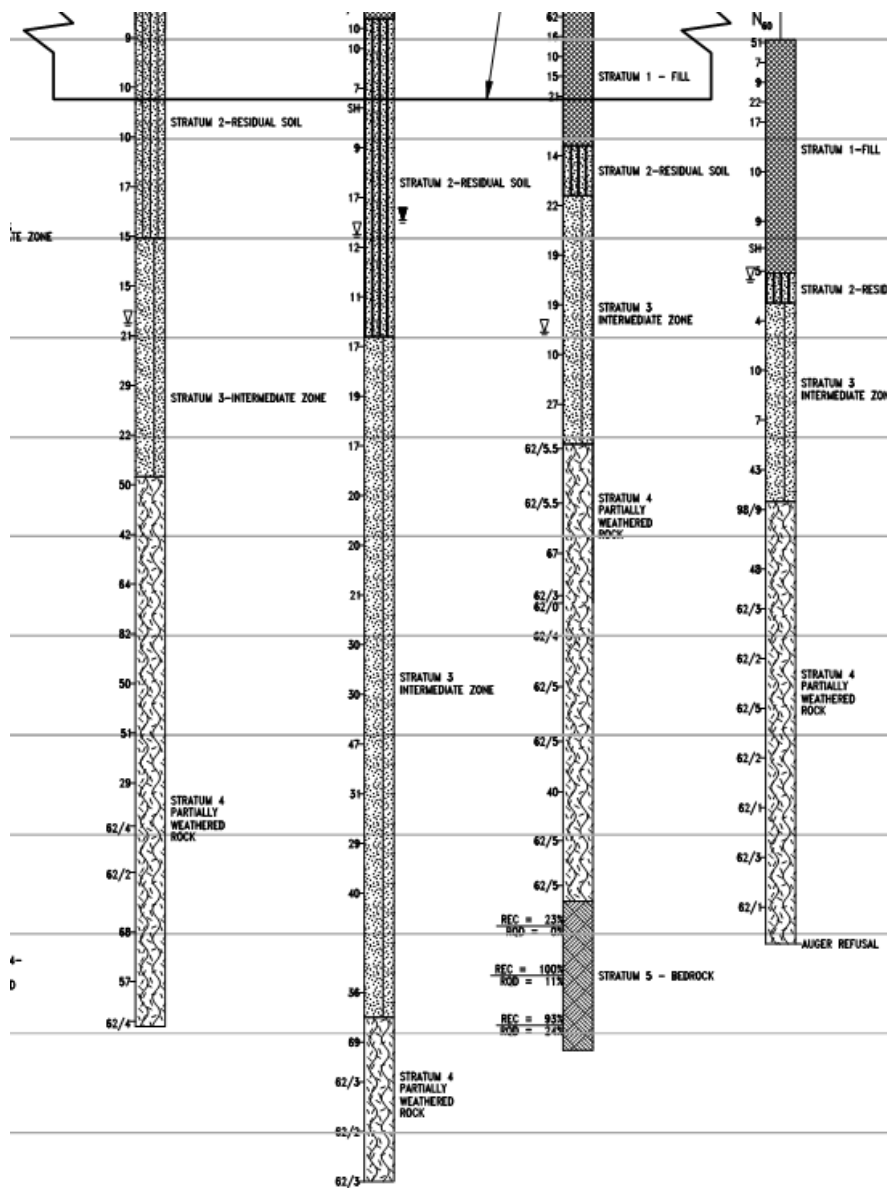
Example Borings and Installation Platform for MLK Elevated Roadway
